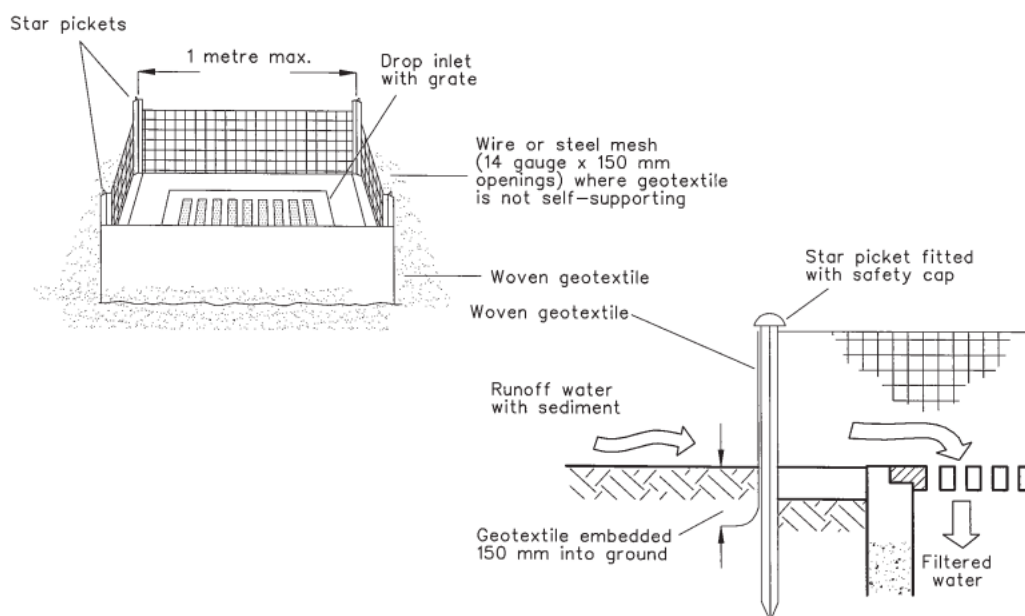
Drop Inlet Protection Measures for Stormwater Pits
